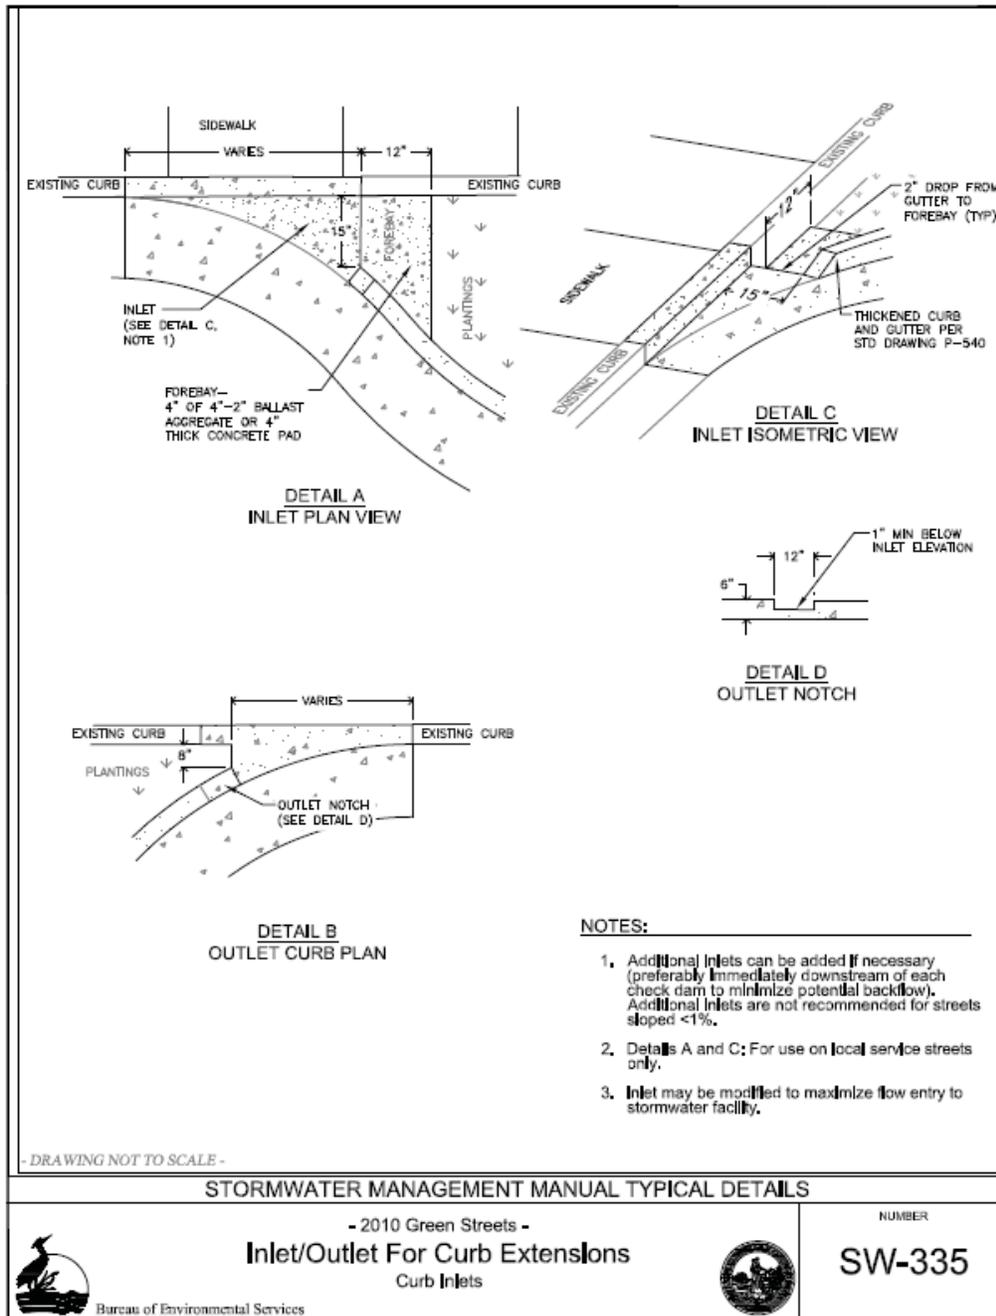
City of Portland inlet/outlet to bioretention curb extension
